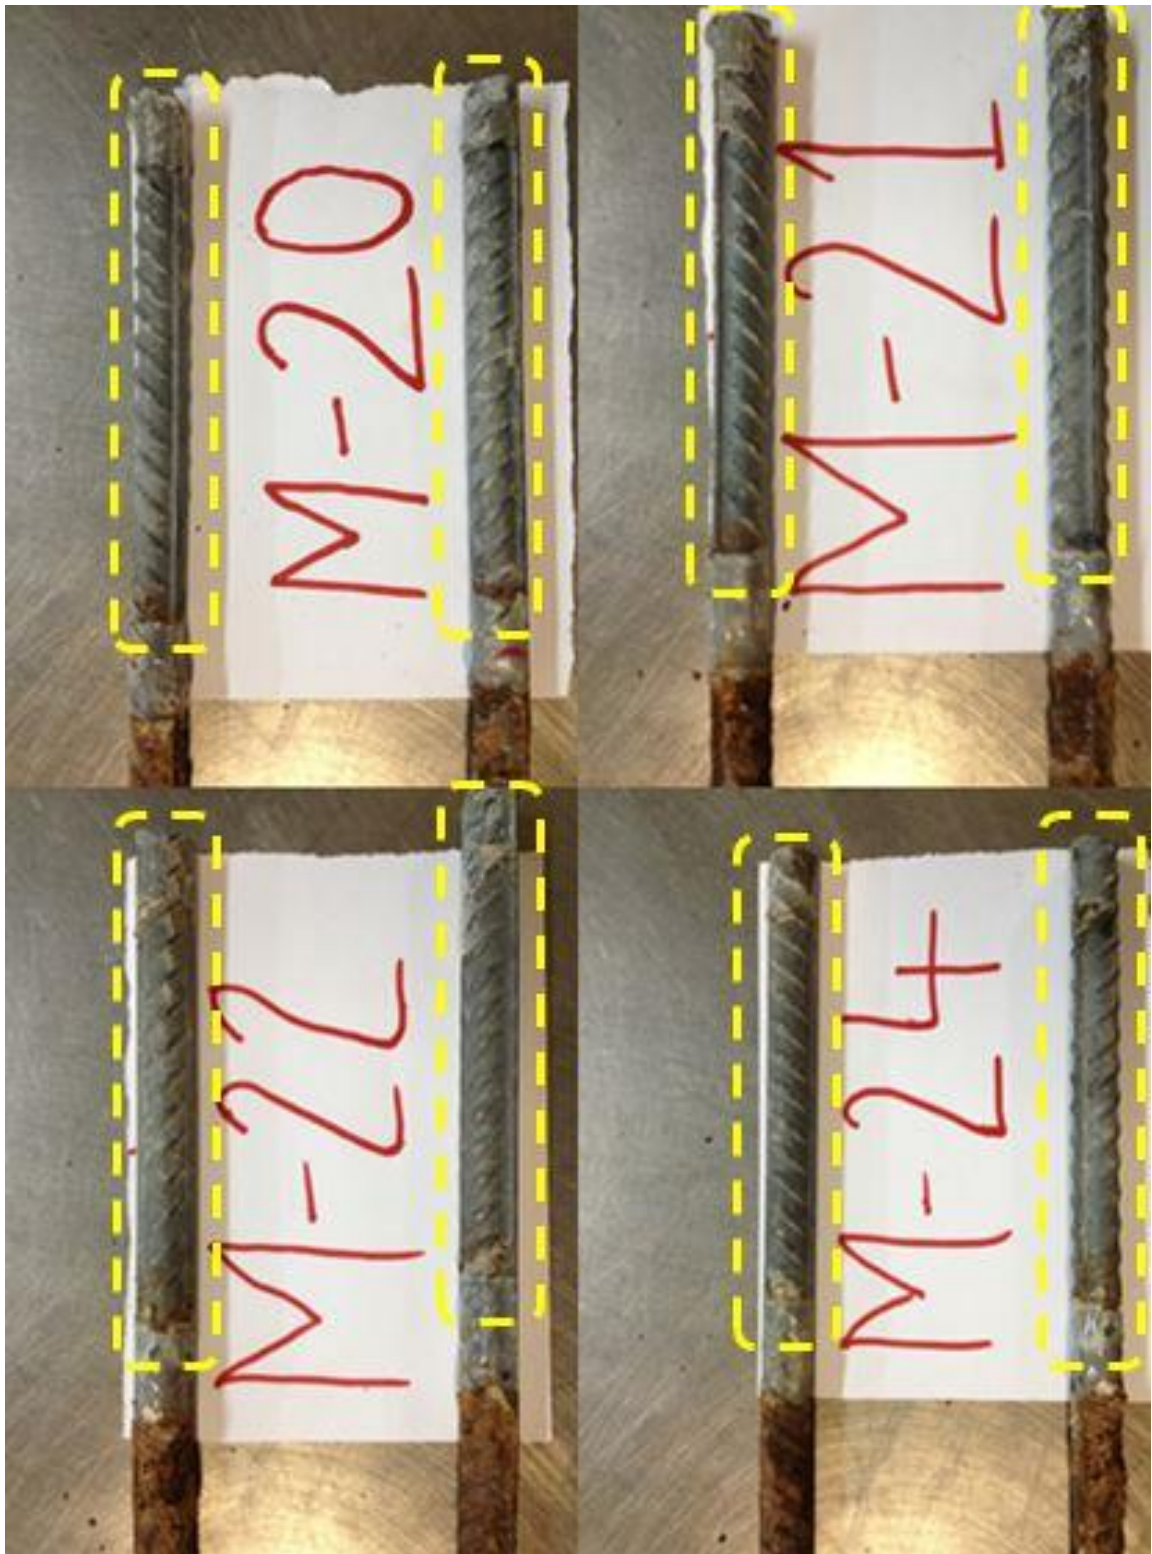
Highlighted portion of the rebar was embedded in concrete (Mixes no.13 to 16)
